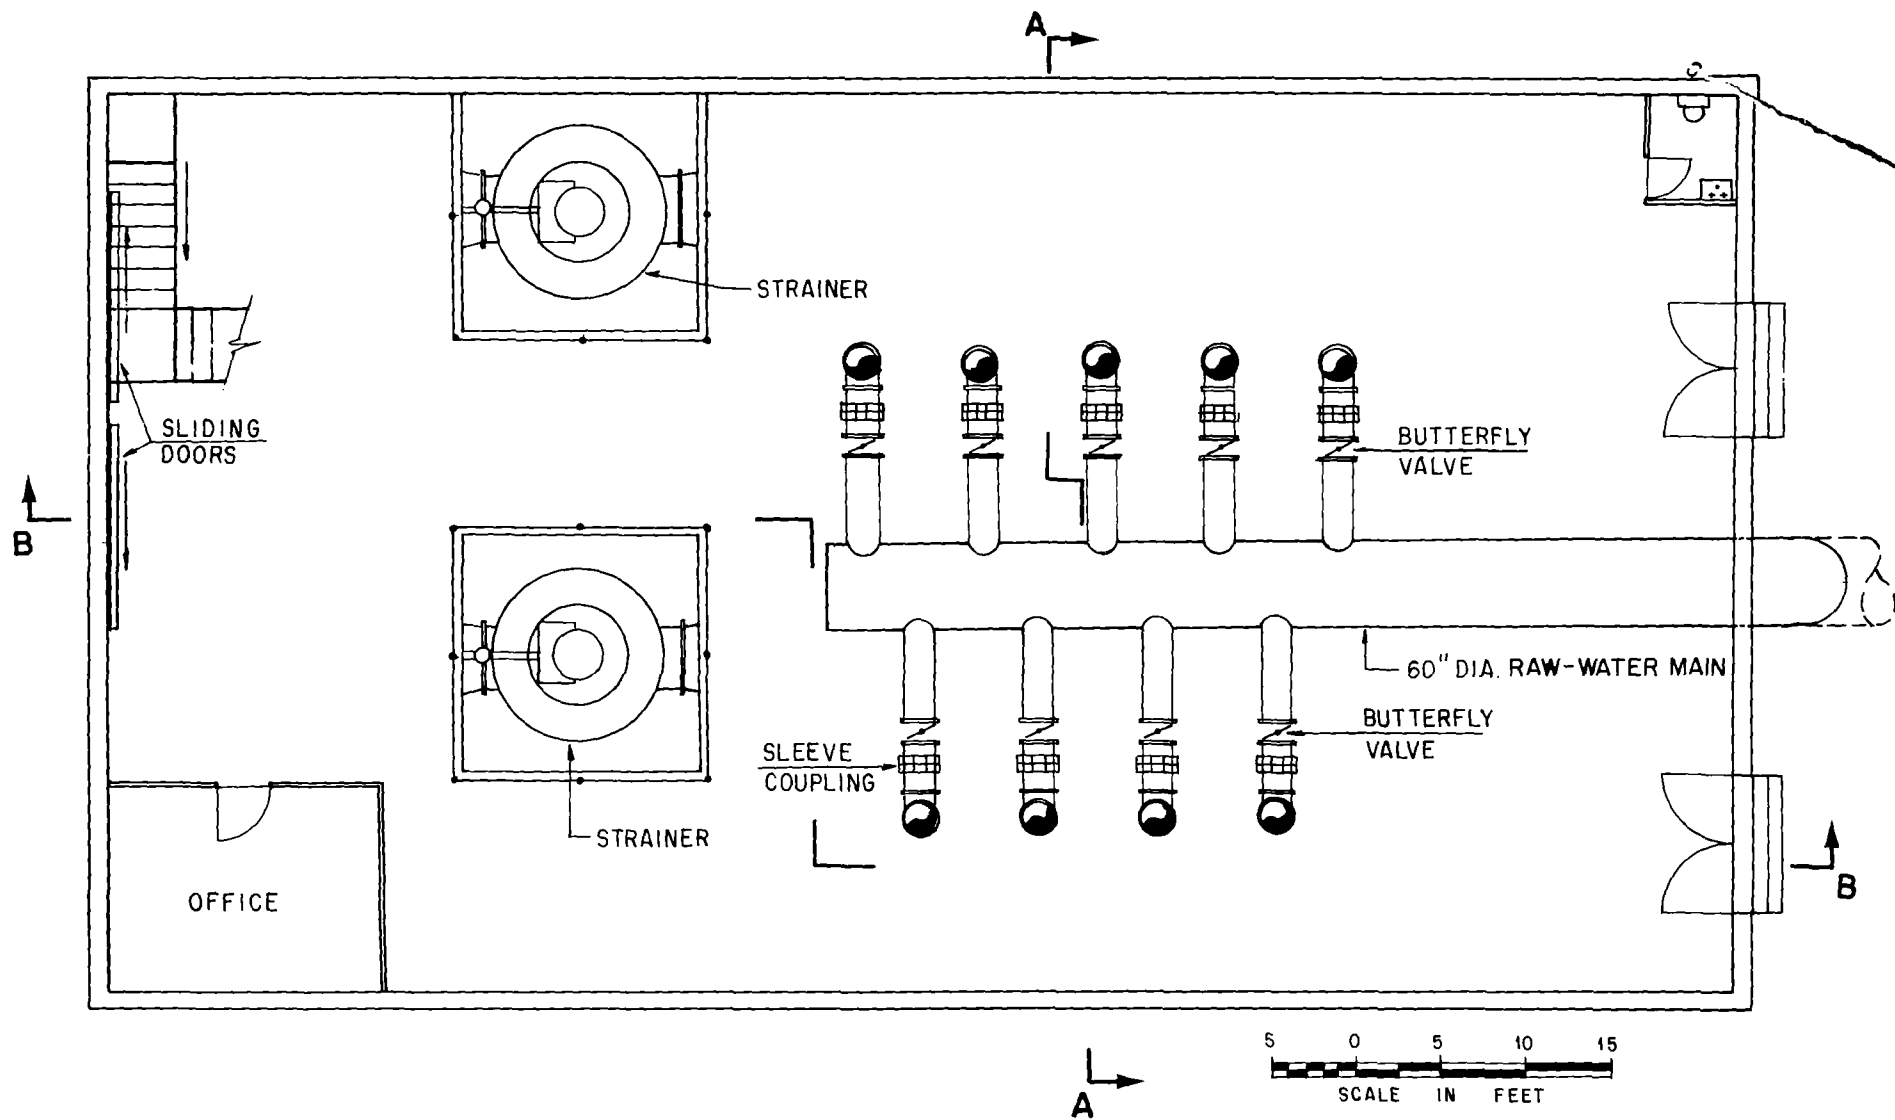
OROPOUCHE RAW-WATER PUMP STATION -- PLAN AT ELEVATION 202
